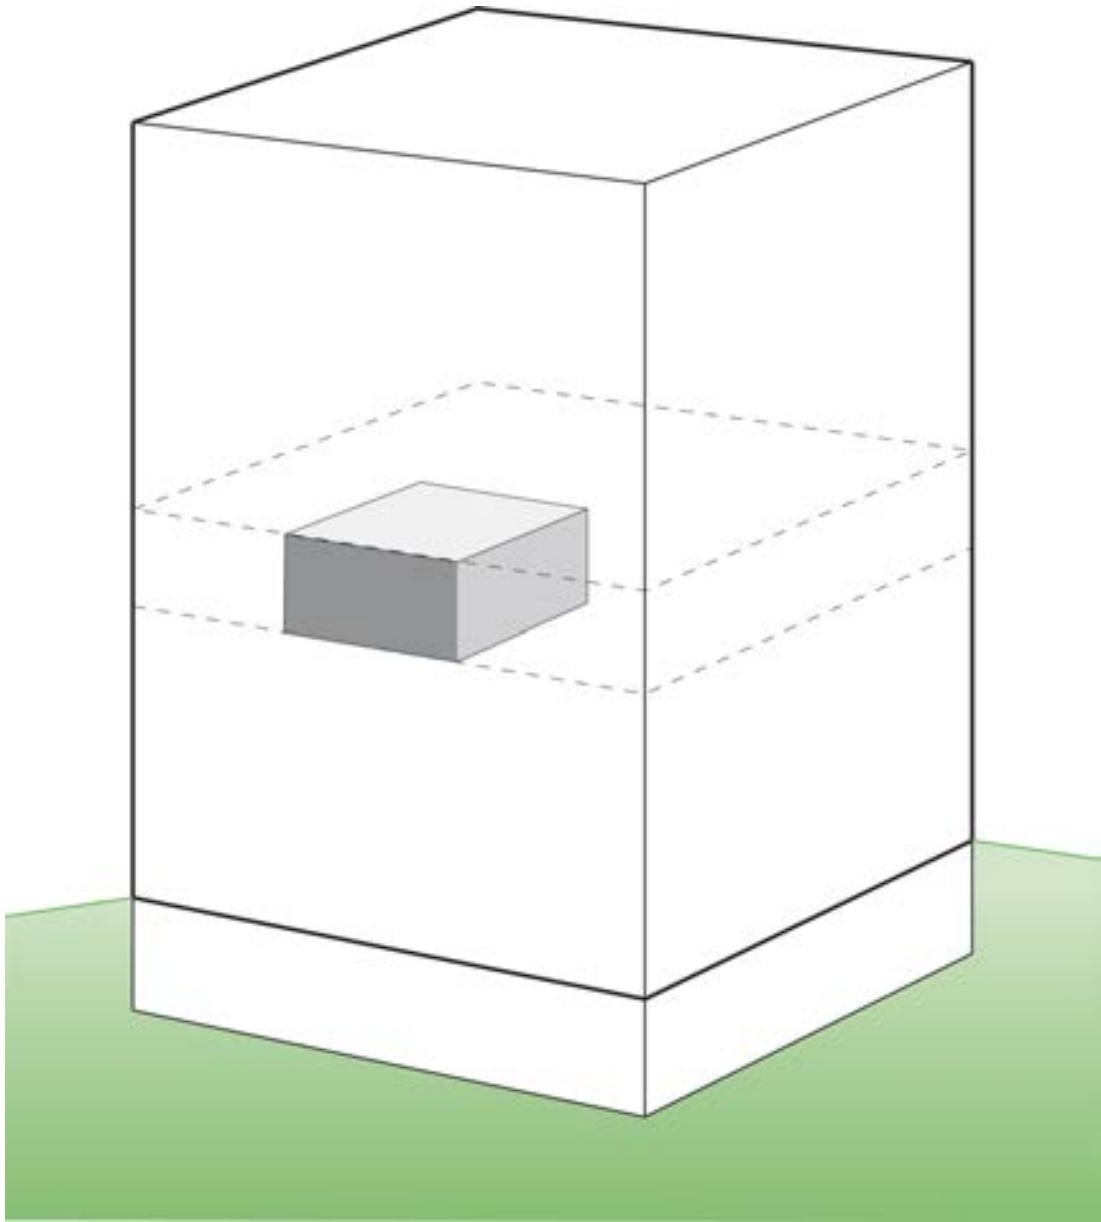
Multi-storey building with floor spaces isolated from vertical shafts
